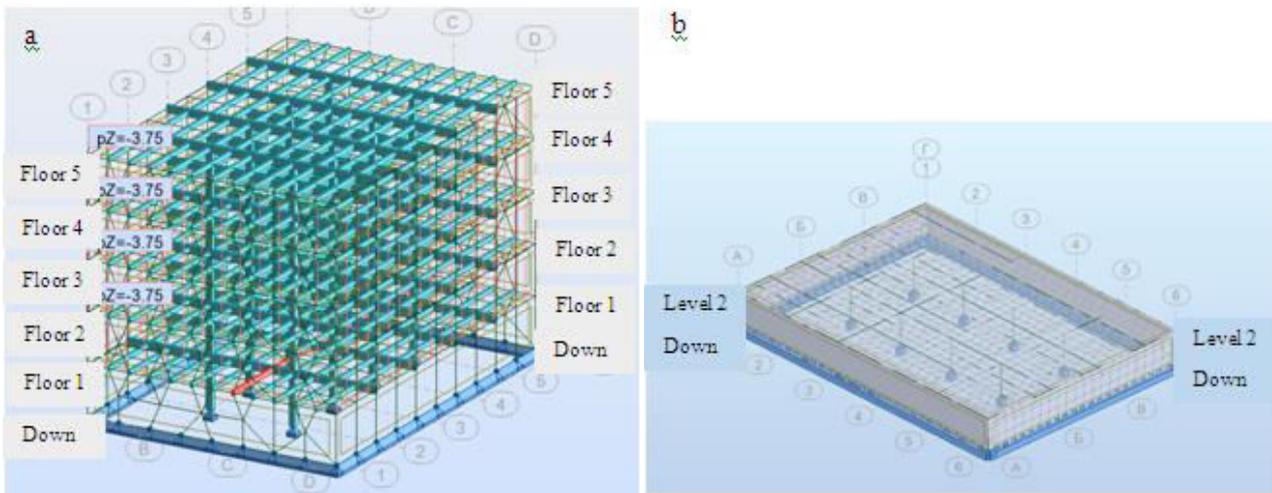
(a) Building models (frame and exterior wall fence); and (b) its floor, as a result of the integration of Revit and Robot Structural Analysis Professional.
